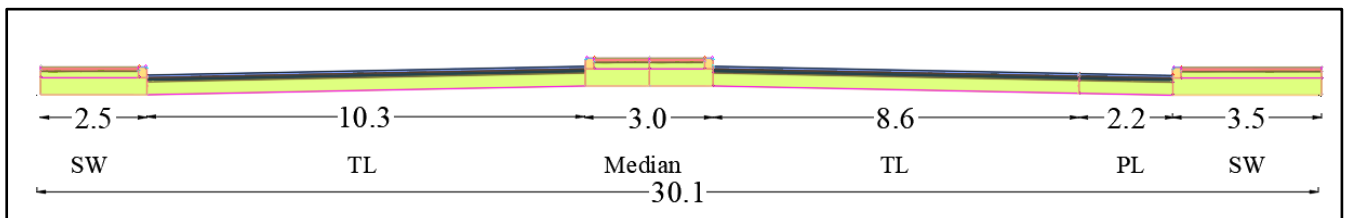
Section No.1- At Al Junaid Street Existing Cross Section
